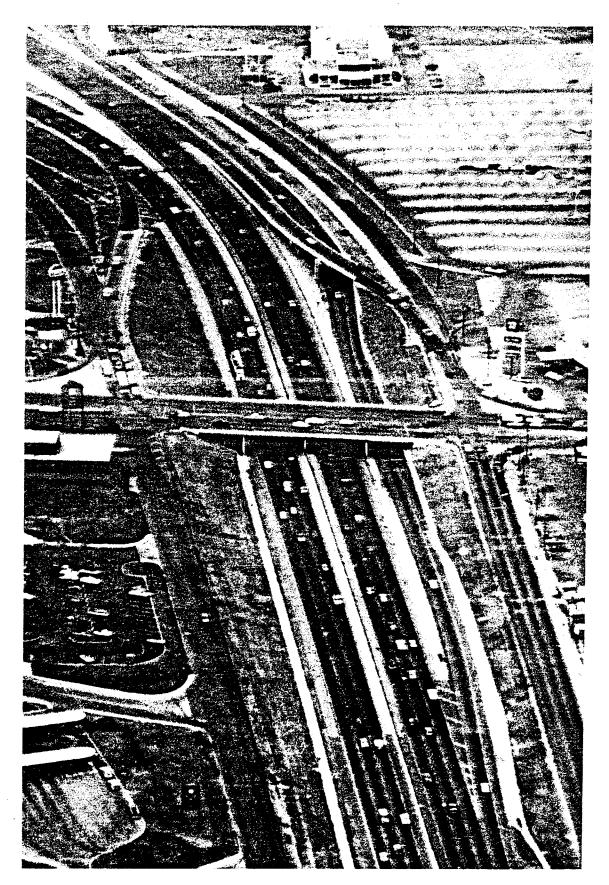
Aerial View of Grade Separated Ramp Connecting Freeway Mainlanes with A Frontage Road
